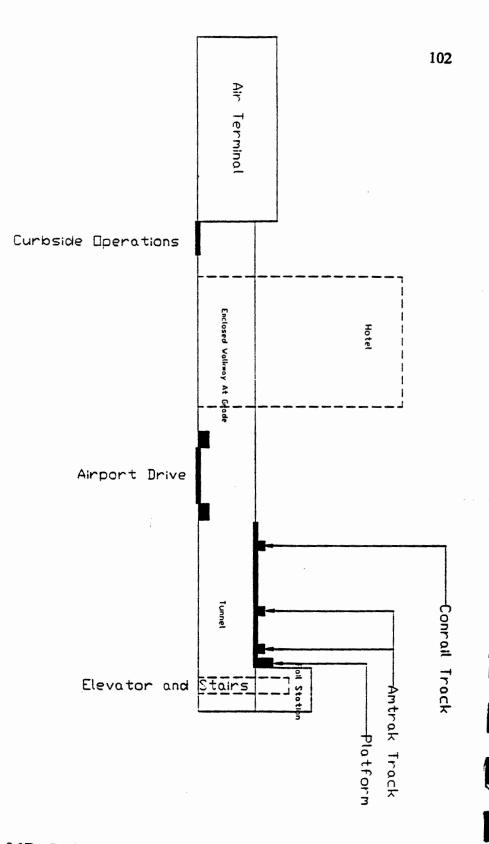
B: Station Side Platform with Tunnel- Profile View
